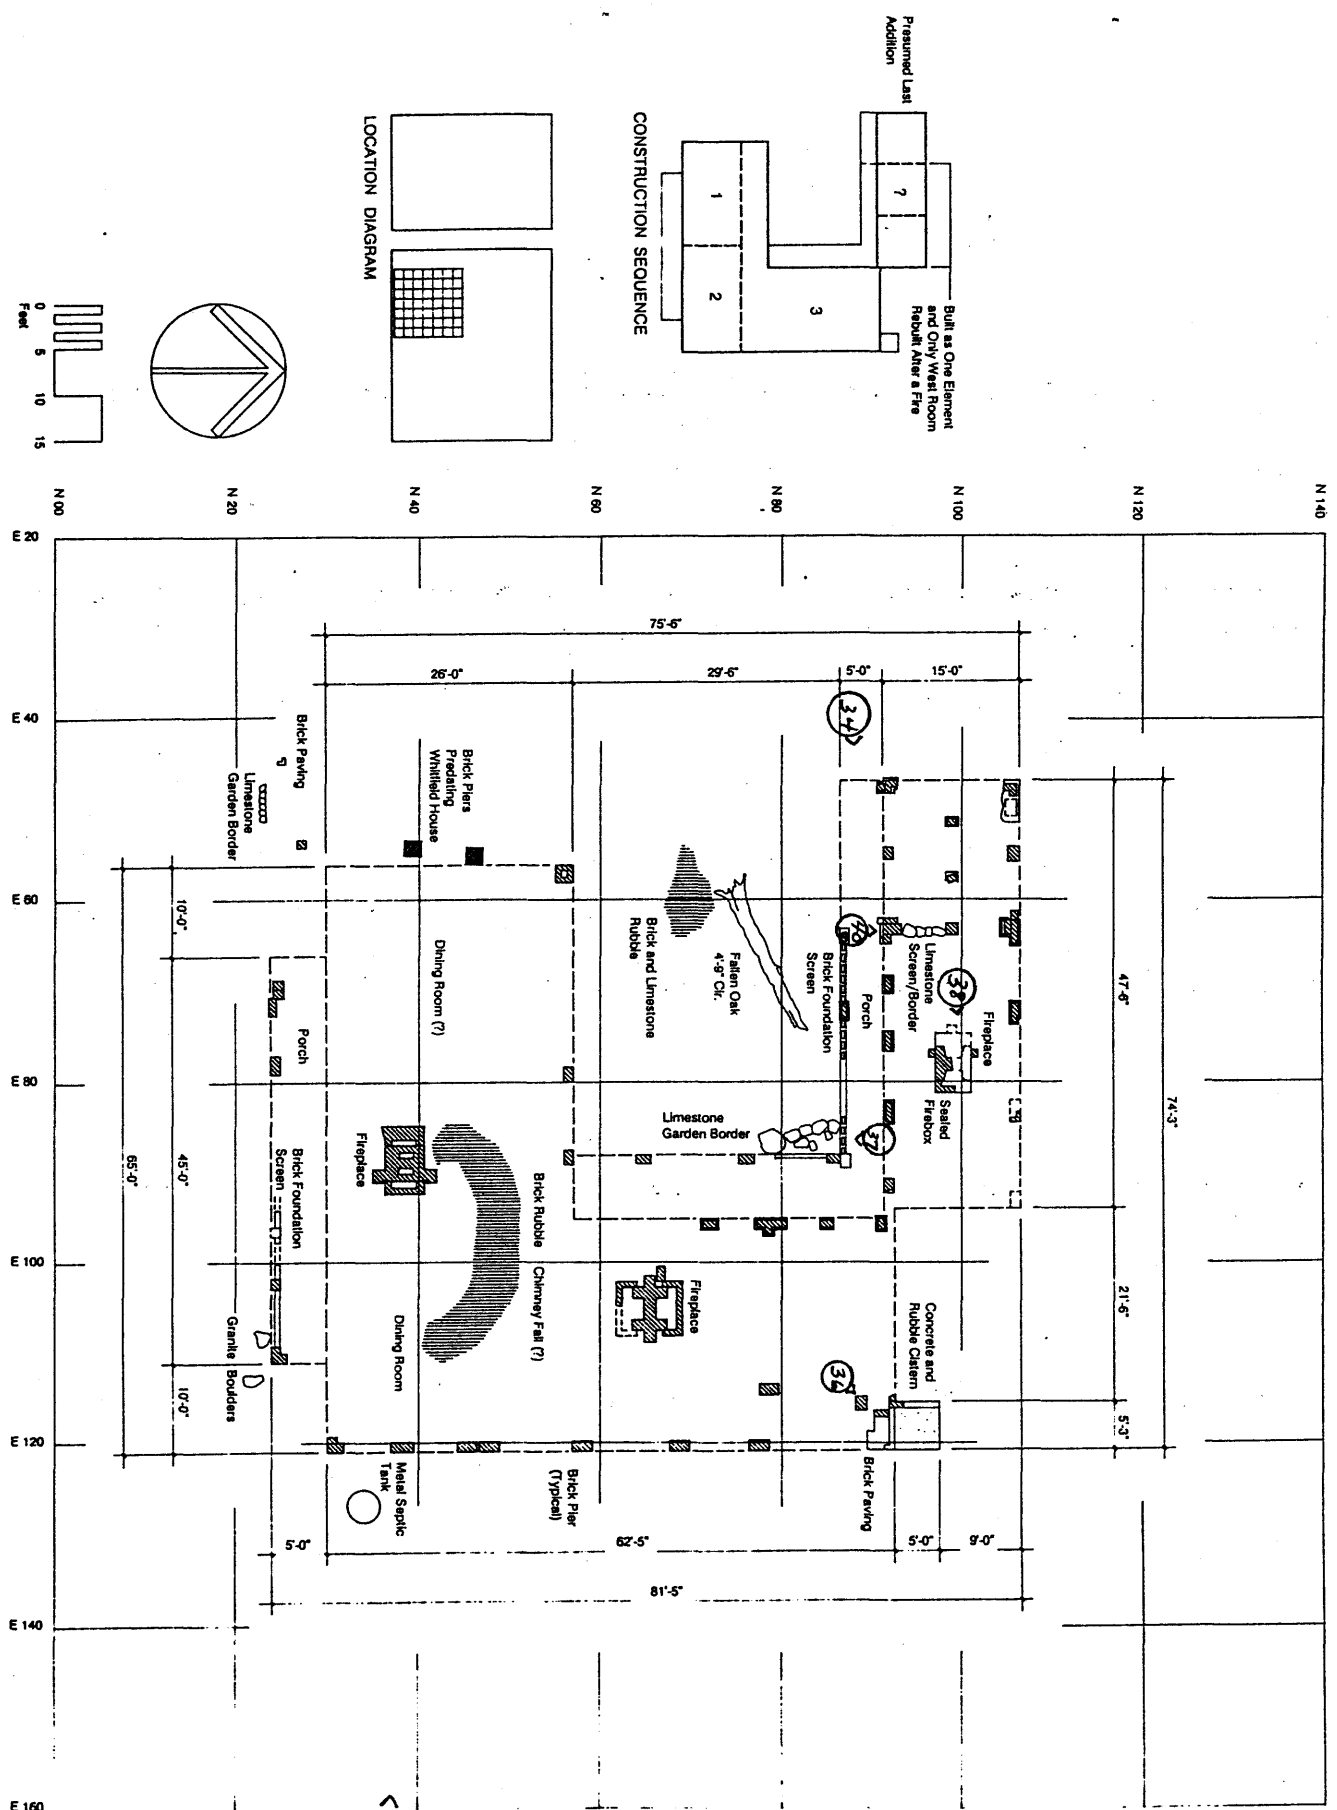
SCHEMATIC PLAN - WHITFIELD HOUSE SITE LLOYD, FLORIDA
